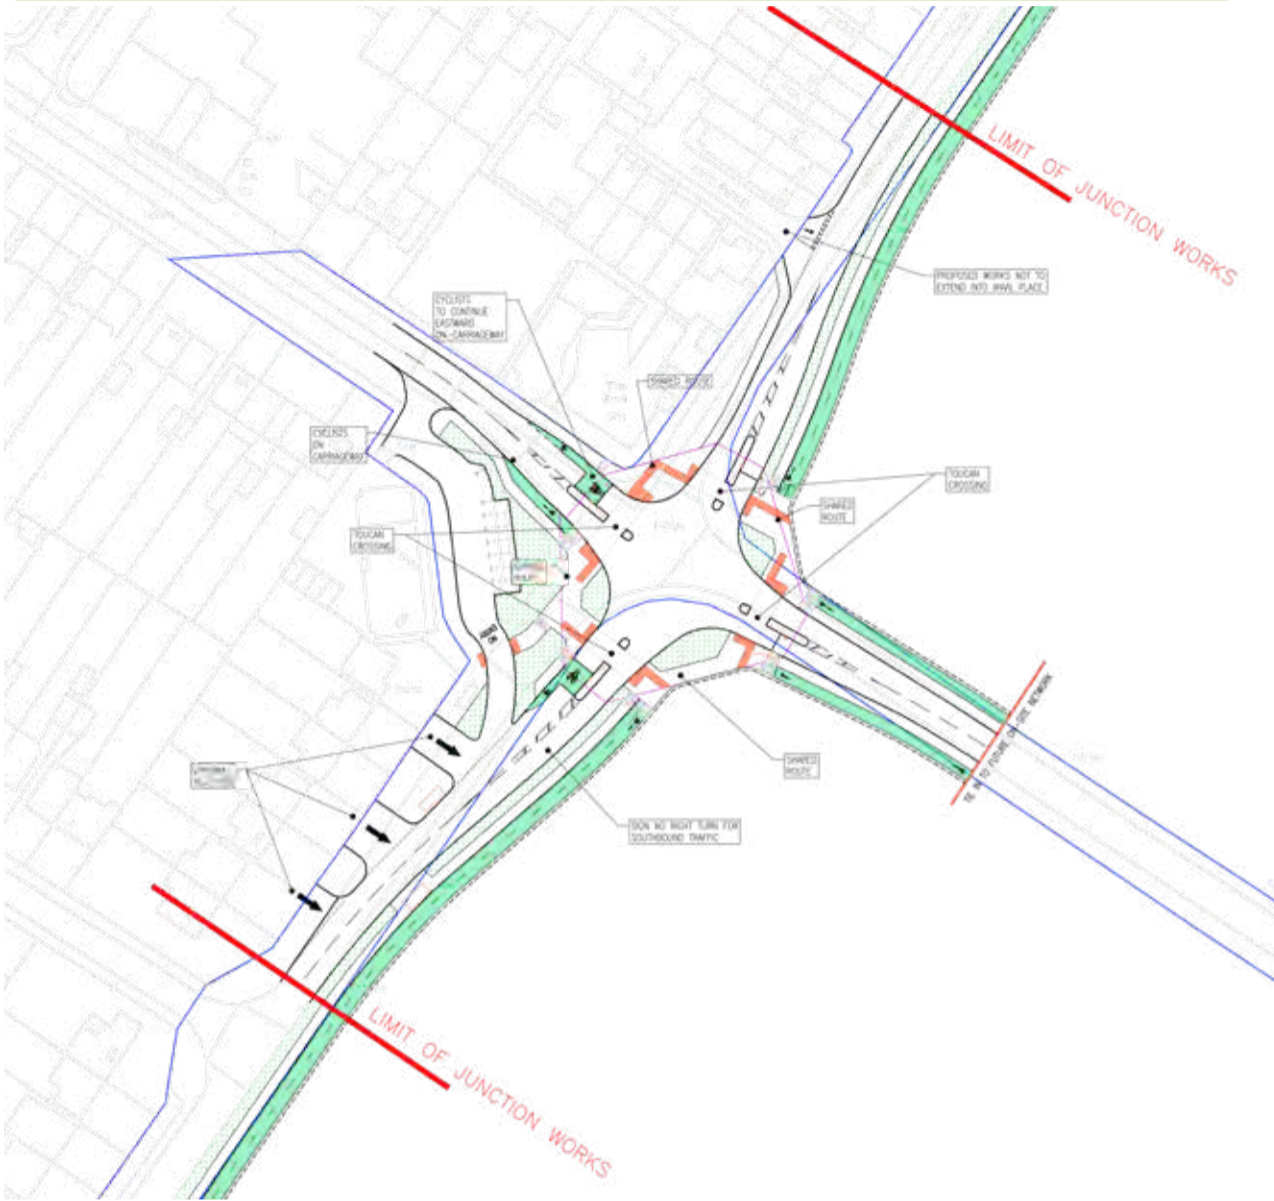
Site Access 7 - Springfield Road / Reddicap Heath Road / Ox Leys Road Amended Junction
